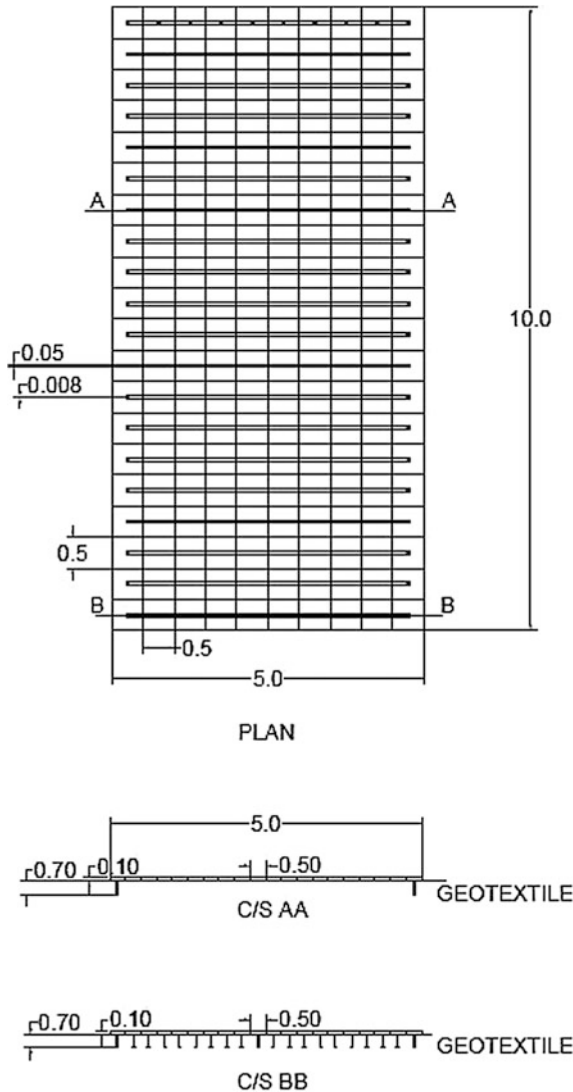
Plan of the setup implemented (All dimensions are in meters)
